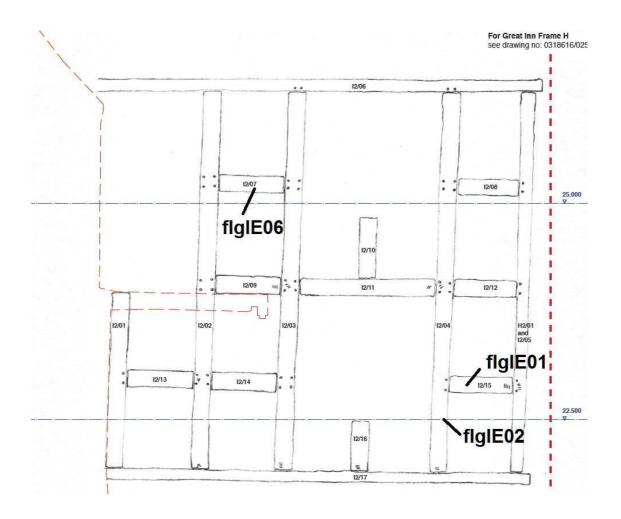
Drawing of the north wall of the southern extension showing the timbers sampled (after Butler Hegarty Architects)
